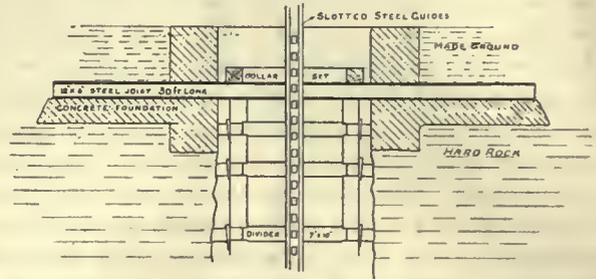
SECTION THROUGH SHAFT WALL AND COLLAR SET.
